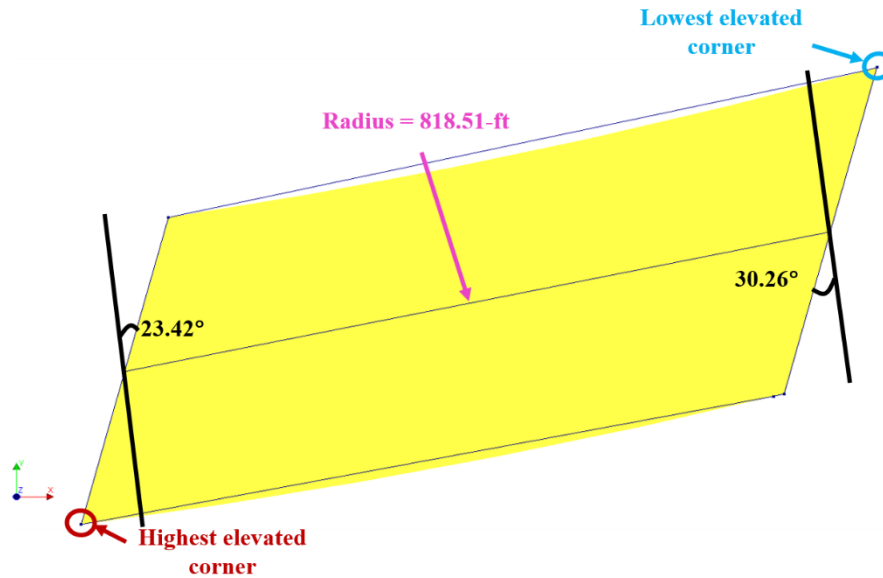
Plan view of highly skewed deck (Span 2 of the SR299 bridge).
